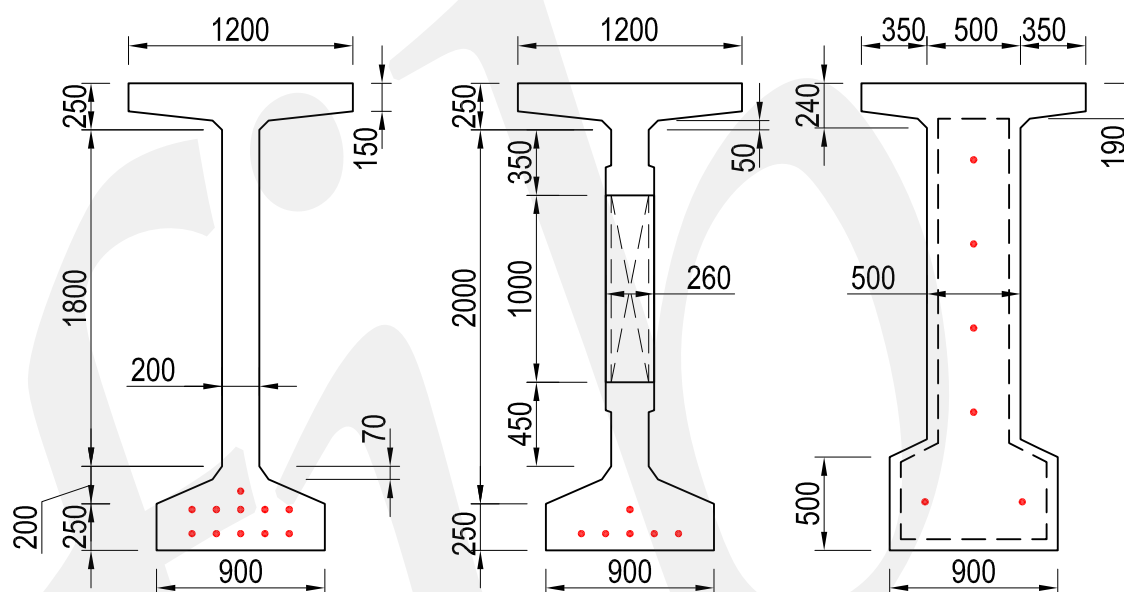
Cross-section dimensions of precast concrete girder. All dimensions are in centimeters. 1 cm = 0.3937 in.
